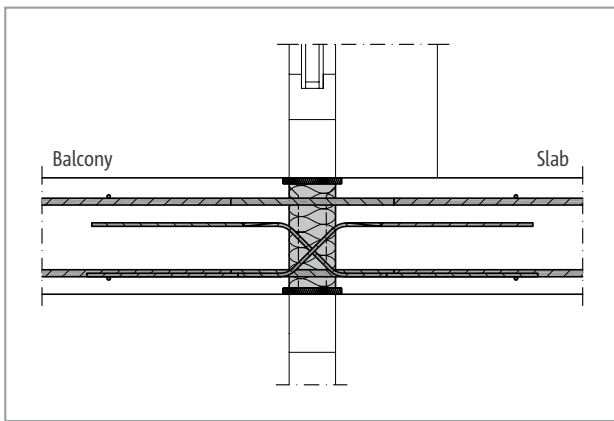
Schöck Isokorb® T type D: Installation section; one-way spanning
